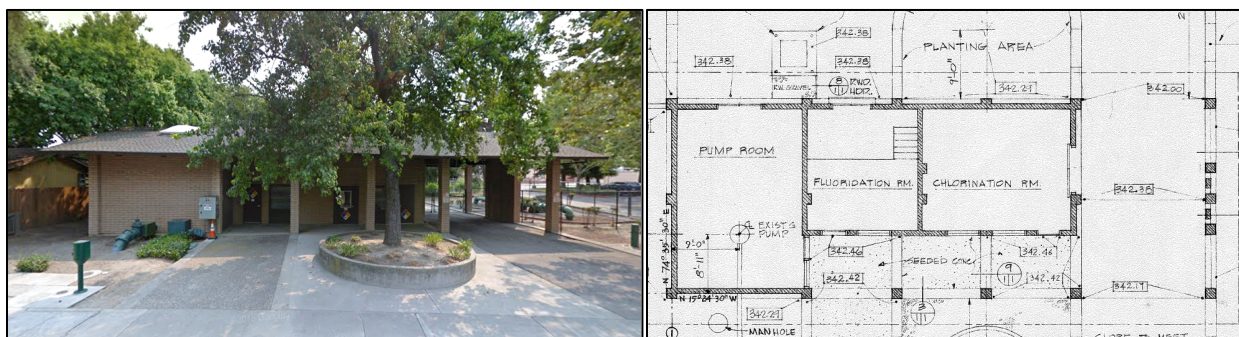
City of Pleasanton Wells 5 & 6 treatment facility with site plan at right showing three-room division.³³⁵
